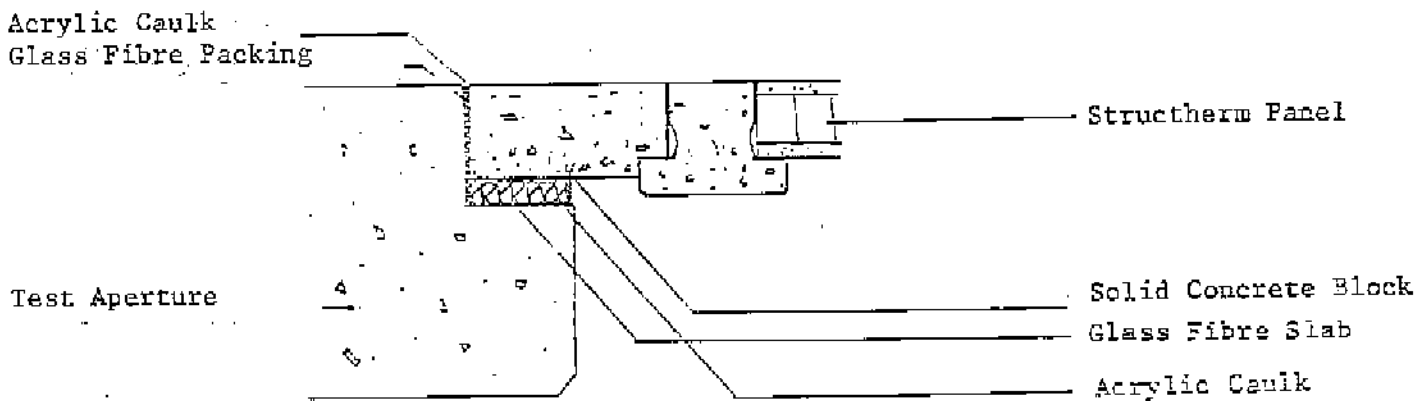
Trent 150 mm Concrete Floor with Structherm Panels
